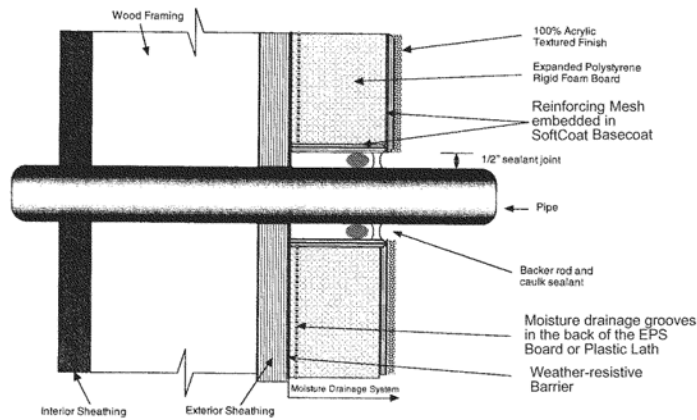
TYPICAL MOISTURE DRAINAGE MD SYSTEM INSTALLATION DETAILS
